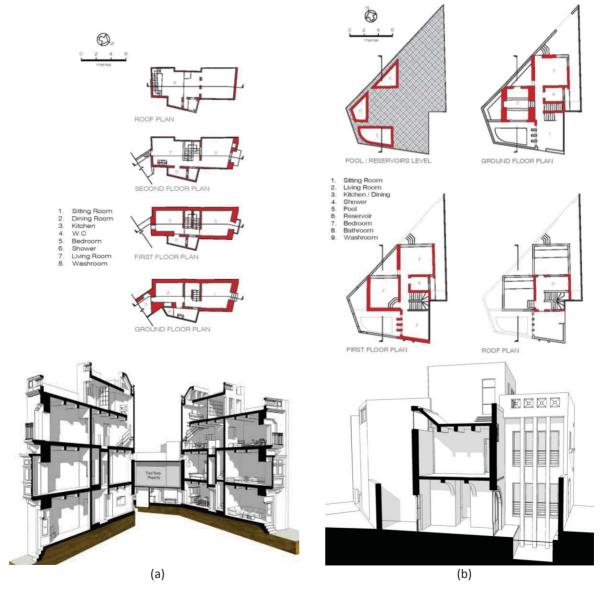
Layout and sectional perspective: Żabbar House (a) and Nadur House (b).
